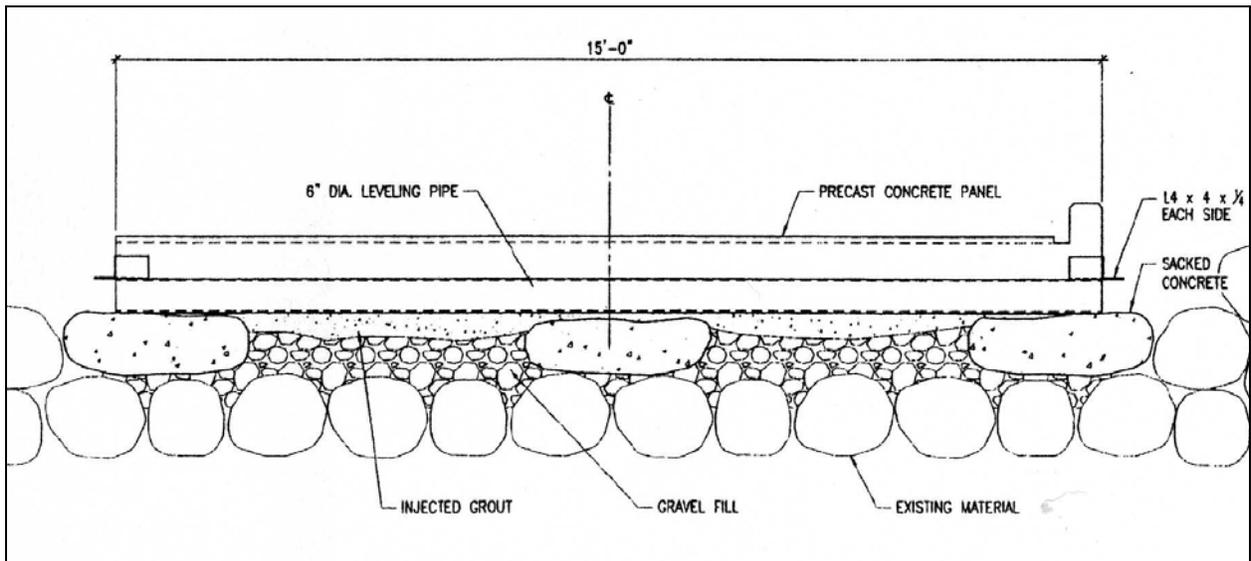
Cross-Section of Typical Boat Ramp Construction
